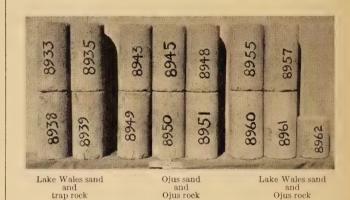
CONDITION OF SPECIMENS MADE WITH TYPE II CEMENT AFTER IMMERSION IN TAP WATER AND DRYING 850
